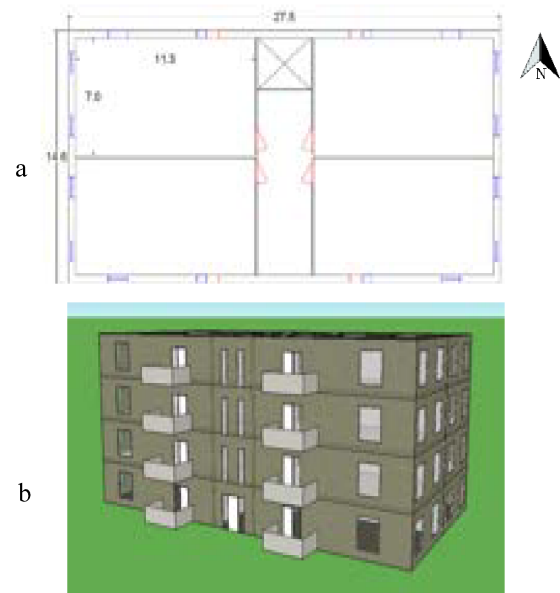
Scheme of the building model's geometry. (a) The plan of the building (dimensions are in meters). (b) Modelled building in IDA-Indoor Climate and Energy (IDA-ICE)
